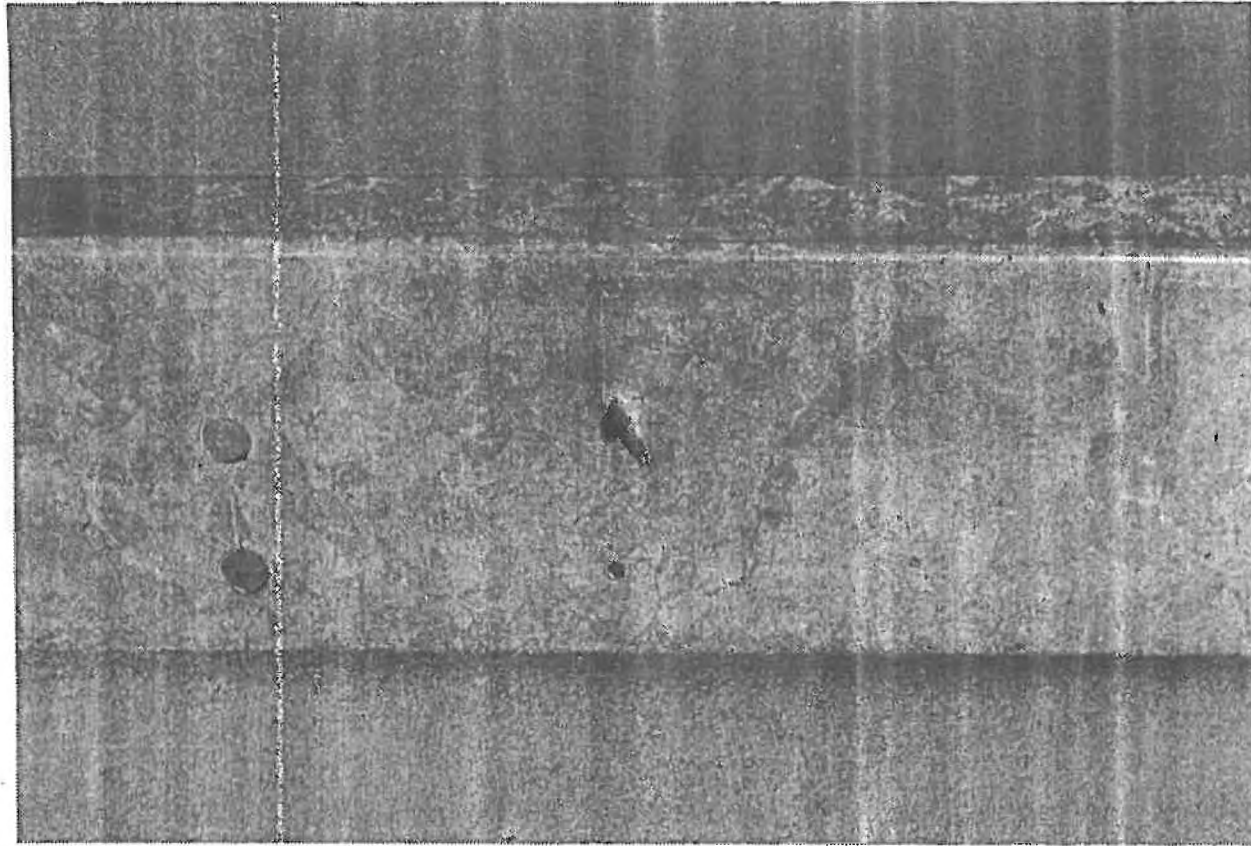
Photograph of Typical Nail Anchor After Failure
